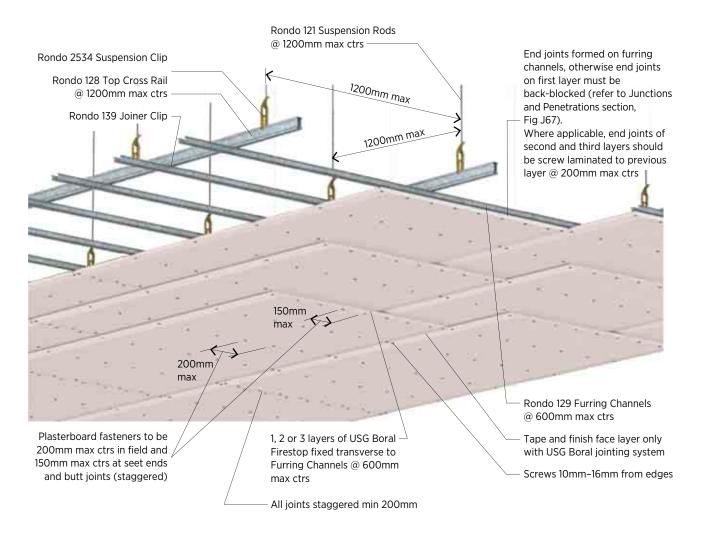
Fire Rated Ceiling - Screw Fixing Layout
